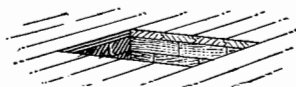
Incorrect Way of Finishing Brick Shaft to Receive Sheet Metal Connection
